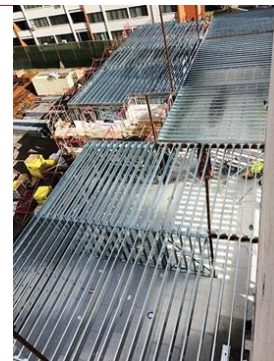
Example of a flooring system utilising cold-formed steel beams (Wills 2015)
